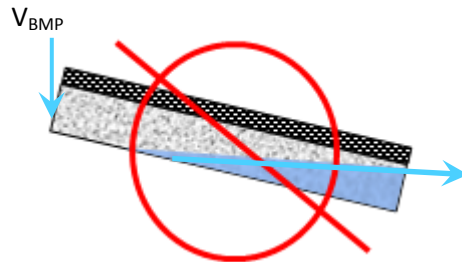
Sloped Cross-Sections for Permeable Paving
